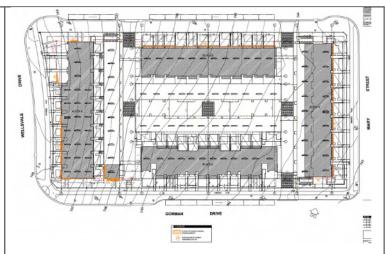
Encroachments NH 2 Structure Plan - North Facing Private Open
